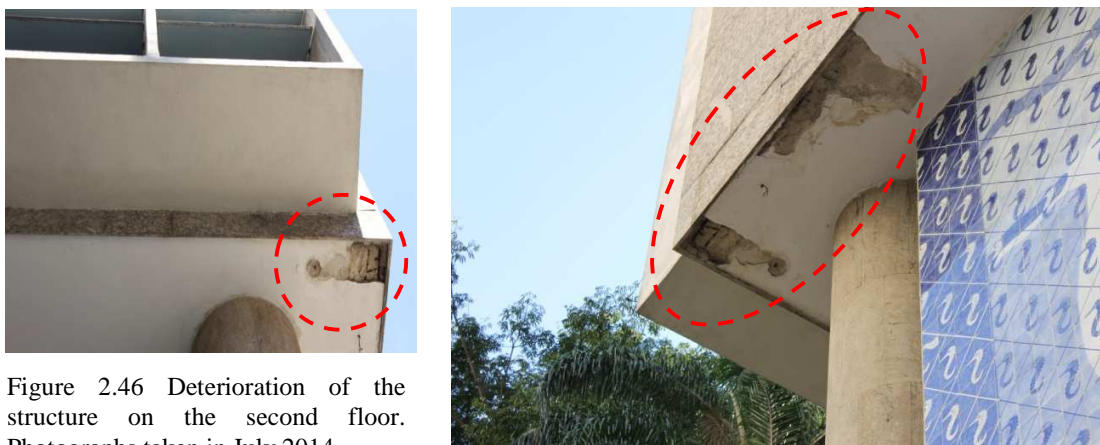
Deterioration of the structure on the second floor. Photographs taken in July 2014
